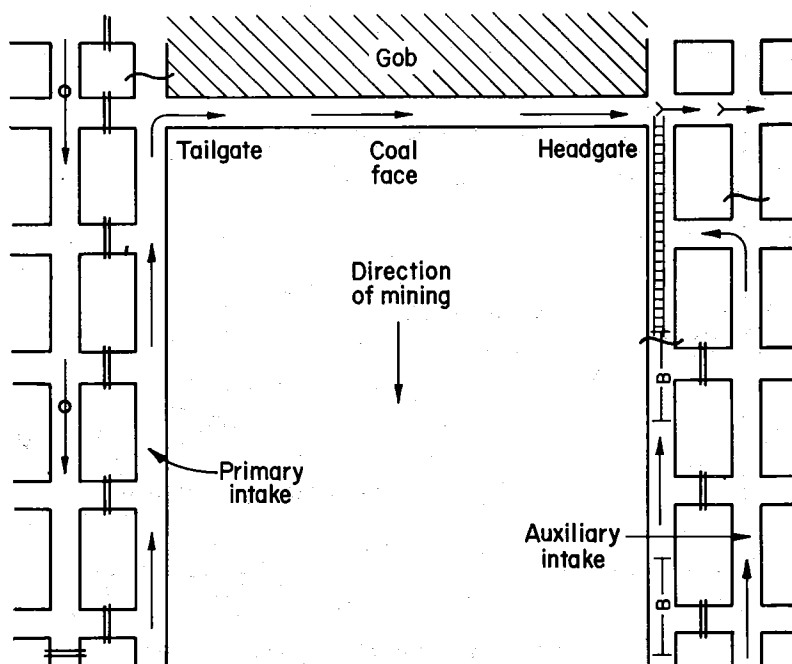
Typical longwall panel layout for tailgate-to-headgate face airflow.
